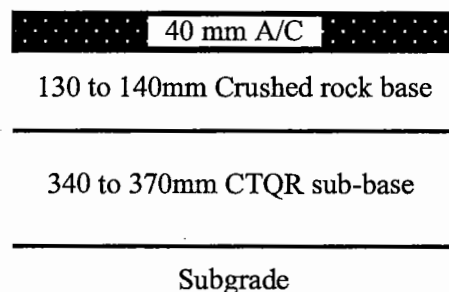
ROAD LAYOUT FOR KINGS ROAD
